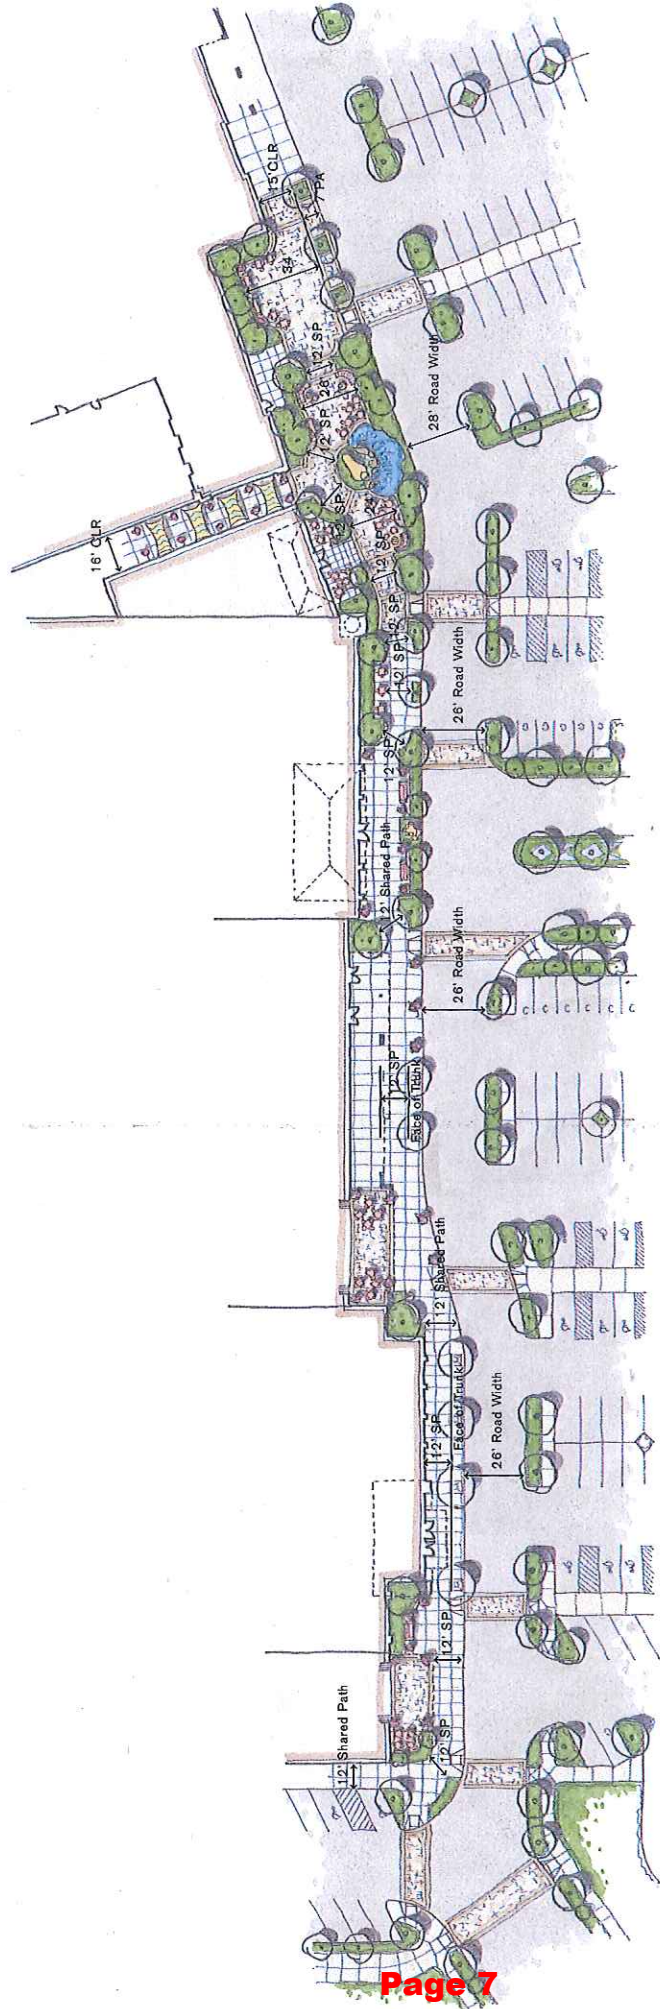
BUILDING FRONTAGE LANDSCAPE PLAN
